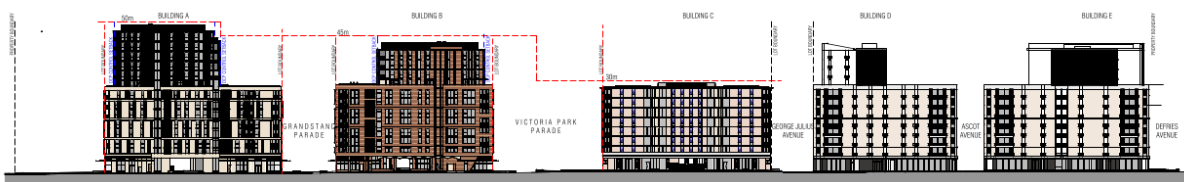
Precinct Elevation viewed from Zetland Avenue (southern elevation)
